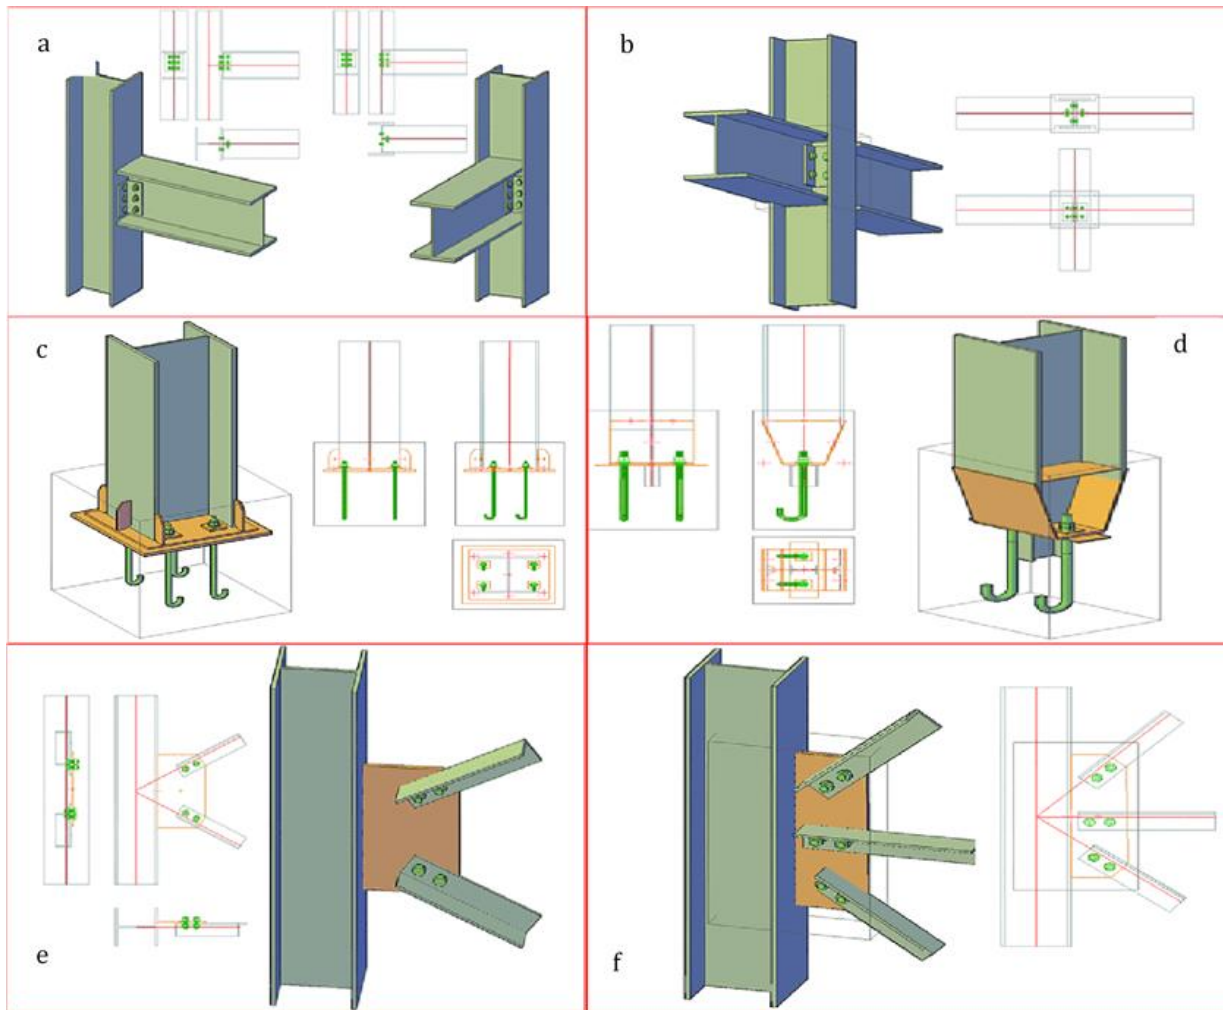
Detailing of some types of steel joints: a, b) Beam to columns - c, d) base plates -e, f) bracing
